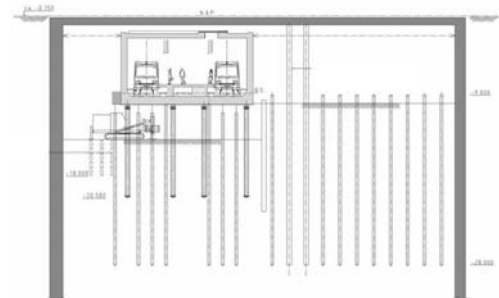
Building pit contours new metro station, situation at the end of Phase 1
